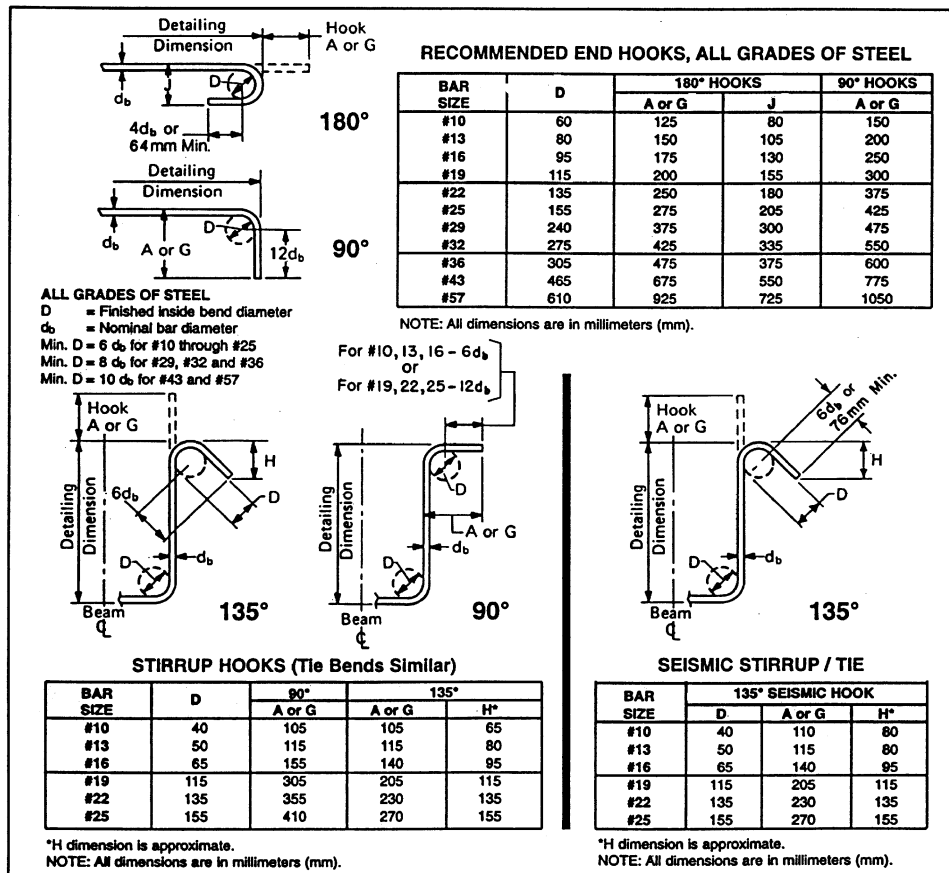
Standard hook details for metric reinforcing bars (courtesy of Concrete Reinforcing Steel Institute).
